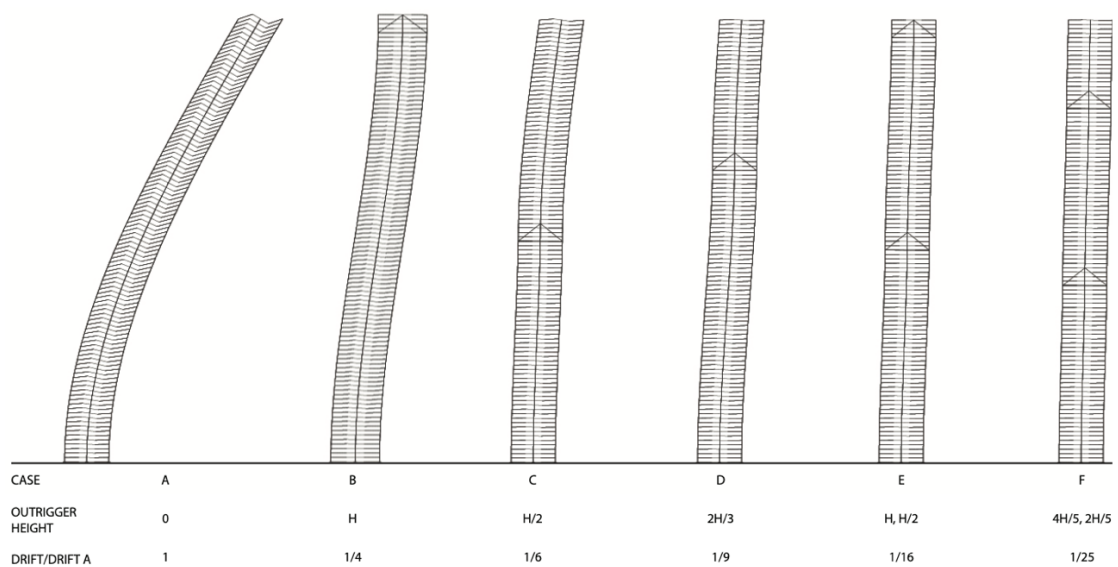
Effect of outrigger locations on roof drift from a simplified case of lateral load at roof only (Source: [11, 25])
